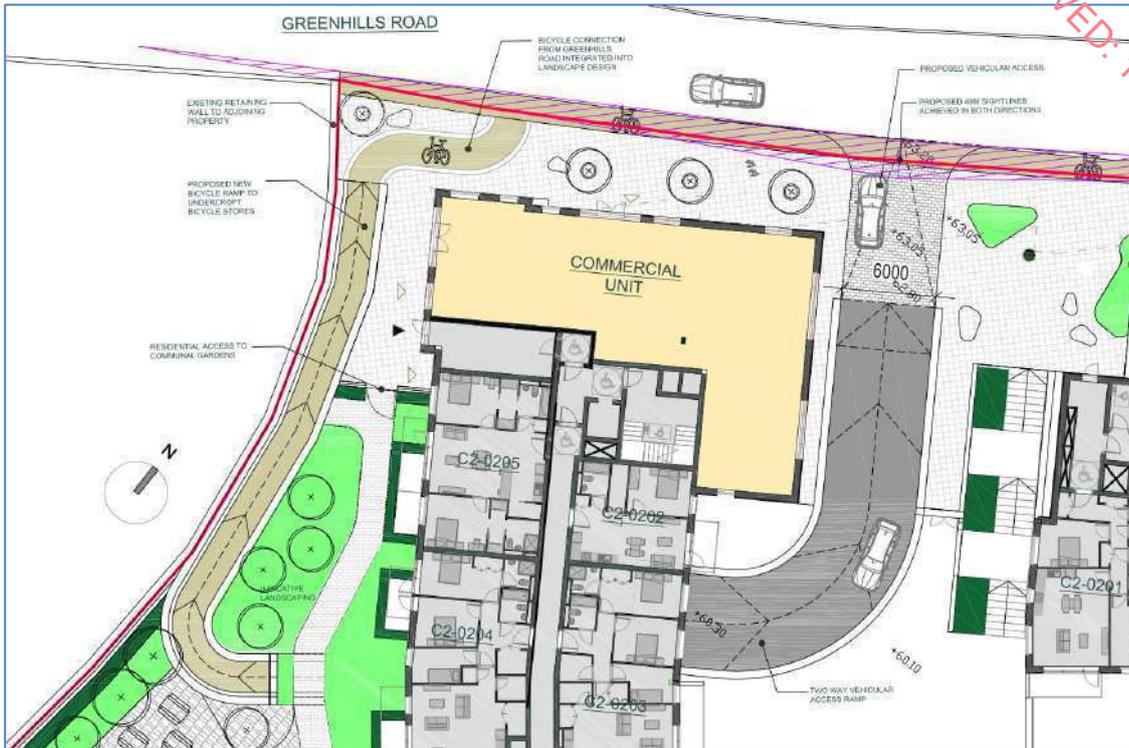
Proposed Alternative Western Greenhills Road Site Access Junction
